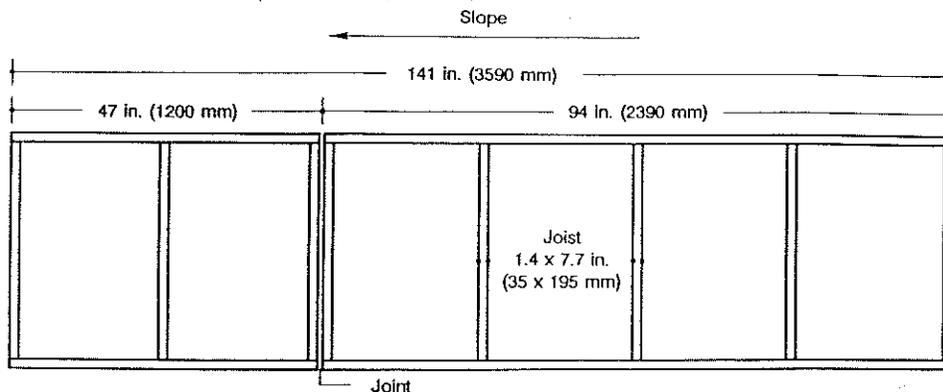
Plan of one set of roofing cassettes with the supporting joists. The moisture sensors are located in the joists.
